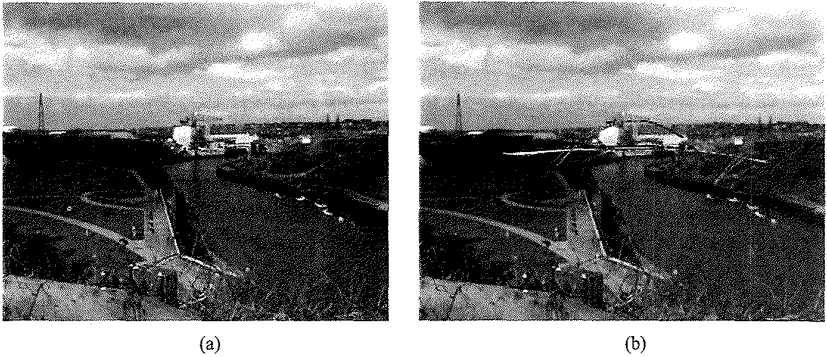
Side view of a new footbridge, planned to be built across the river Wear in Sunderland, UK. (a) Original scene. (b) Augmented with planned footbridge.
